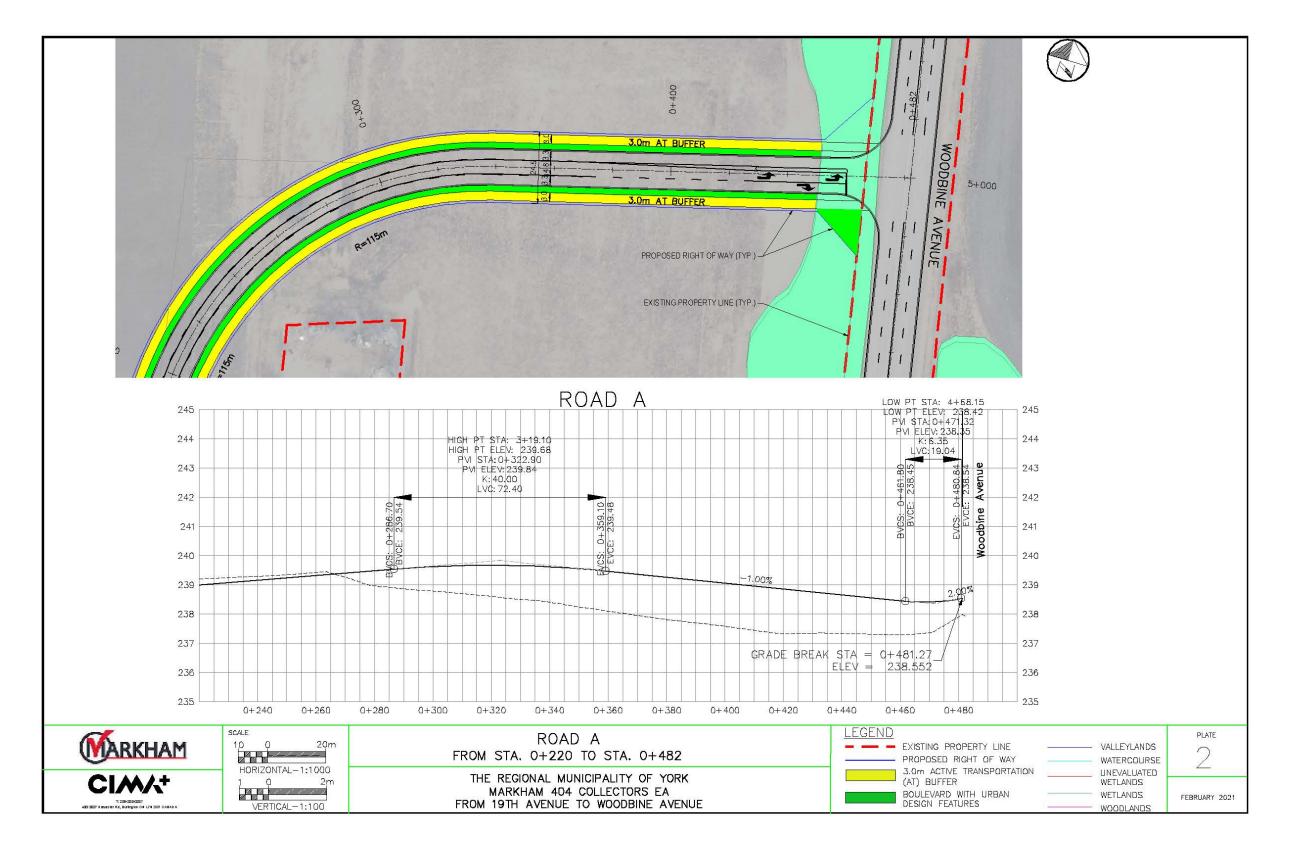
Preliminary Design Plate Road A Station 0+220 to Station 0+482
